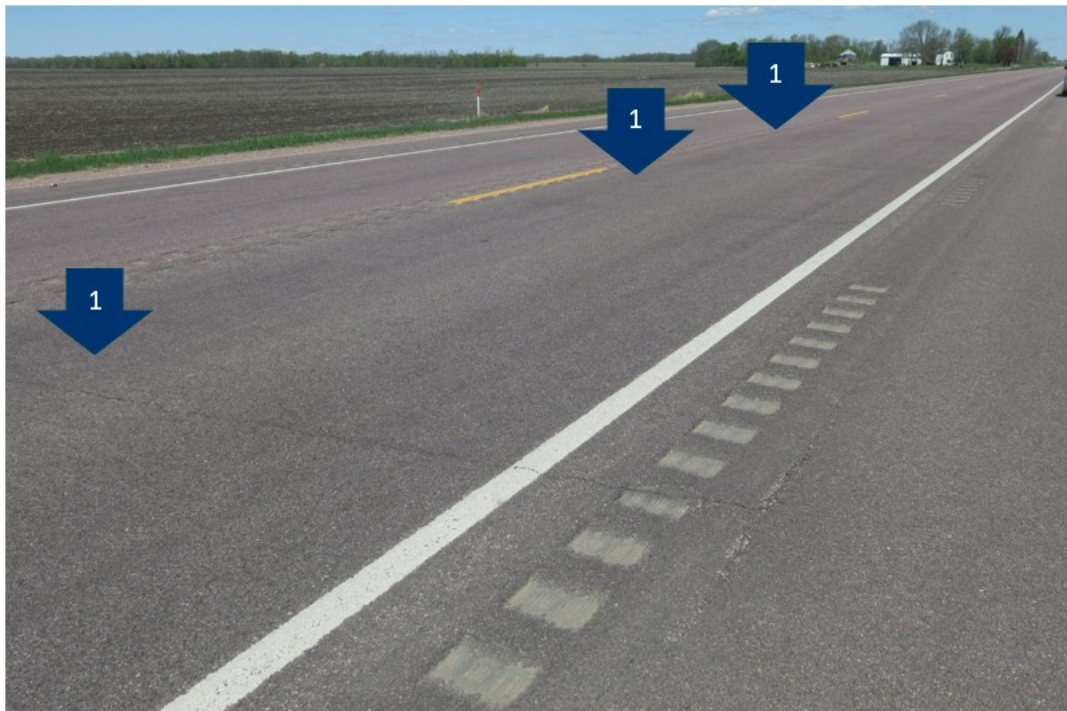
Reflective cracking over transverse joints of the underlying concrete pavement.
